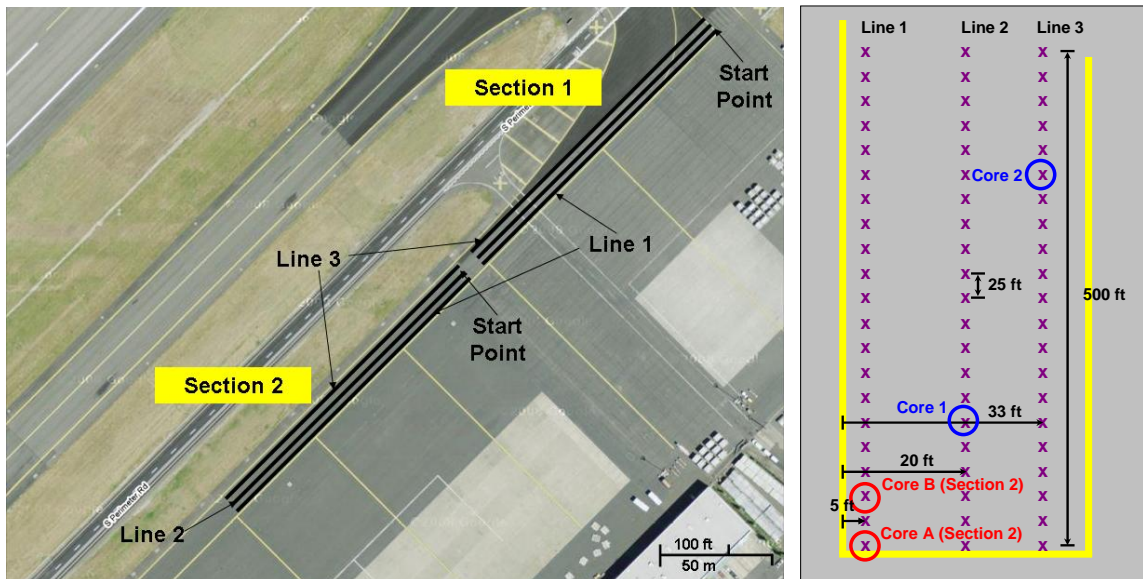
Location of Sections 1 and 2 of E4 and Test Layout
